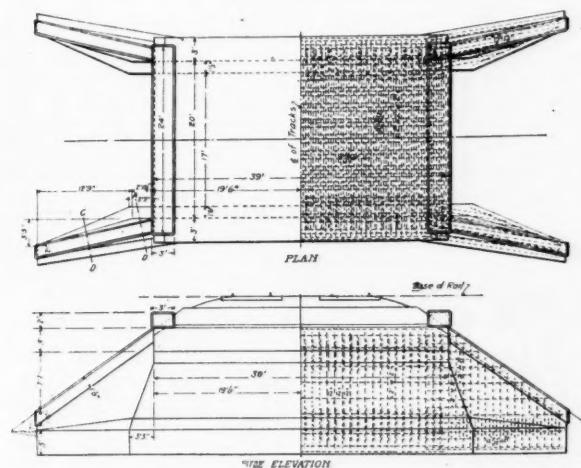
ARRANGEMENT OF REINFORCING BARS IN CONCRETE BOX CULVERT, WABASH R. R.
